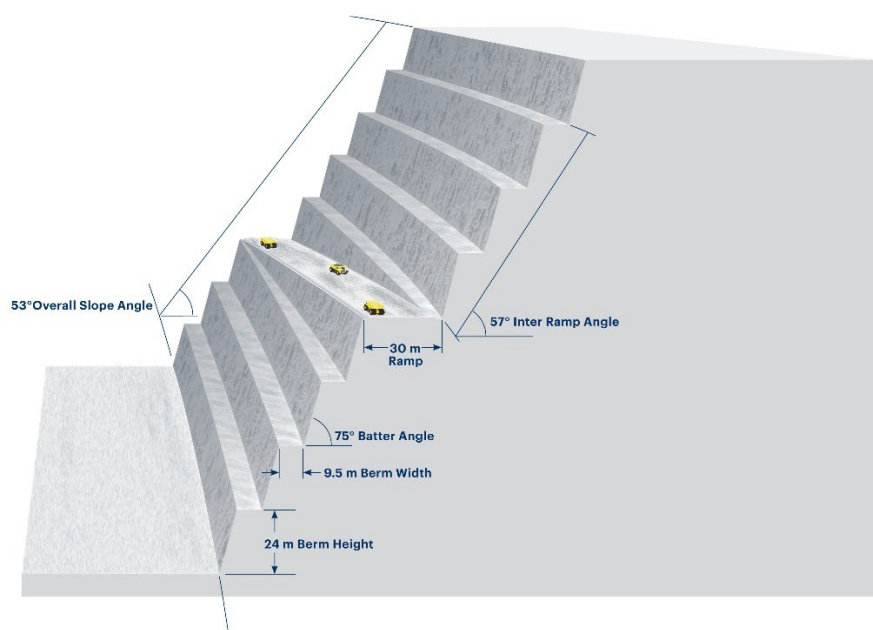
Representation of the pit wall design based on wall design configuration estimates
